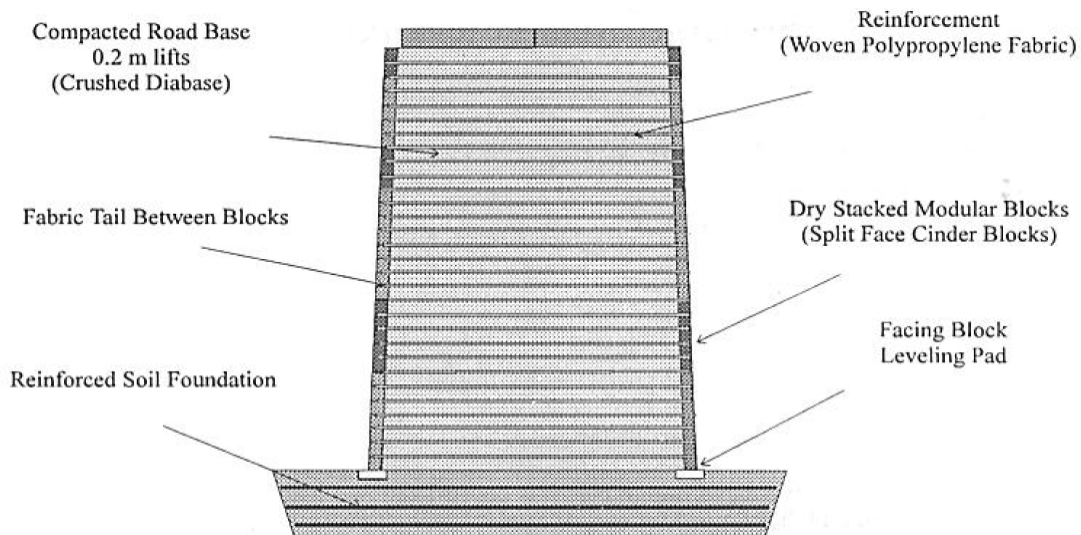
FHWA Bridge Pier Large Scale Experiment Schematic Adams, M. (1997). "Performance of a Prestained Geosynthetic Reinforced Soil Bridge Pier." *Proc., International Symposium on Mechanically Stabilized Backfill*, J.T.H. Wu (Ed) A.A. Balkema, Rotterdam, 35-53. Used under fair use, 2014.
